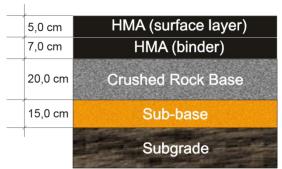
Structure of the pavement BR-232/PE (Cavalcante, 2005)
